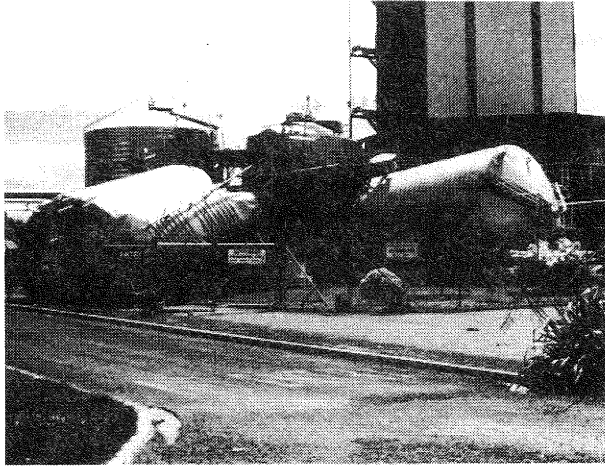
Bay Milk Products - overturned tanks
